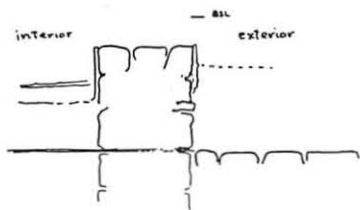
Stratigraphic section detailing the height of the floor and the stoep exterior facing Church Street at the time of the 1803 fire.
